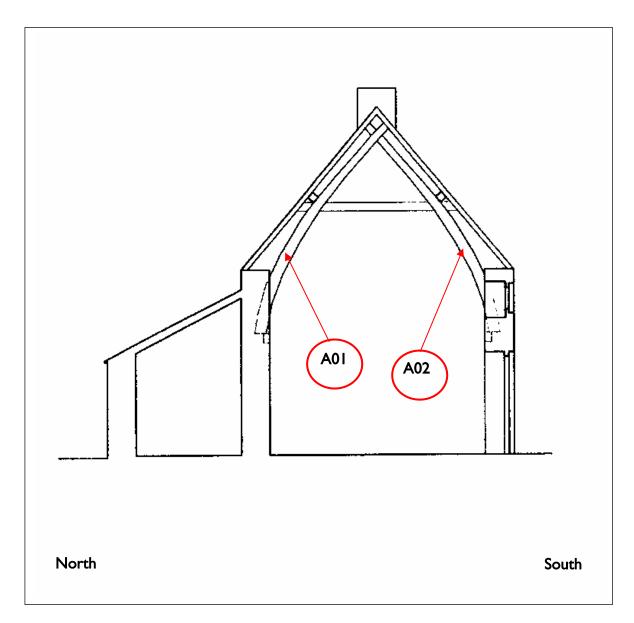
Cross section at truss 2 (in-situ truss) to show sampled timbers (viewed from the west looking east) (after Kevin Doonan, Architects)
